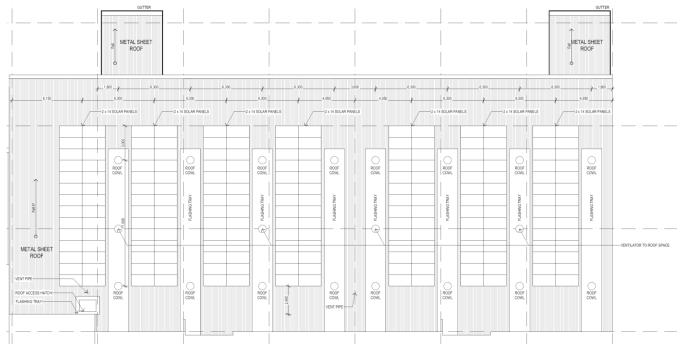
Amended PV layout on the roof of Building J (Source: Fulton Trotter)
